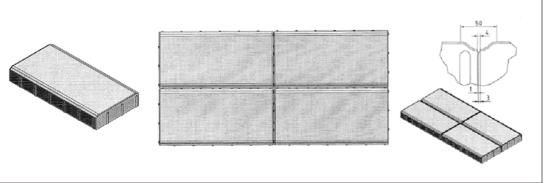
Unilock CNIB-approved tactile grooved concrete paver.
